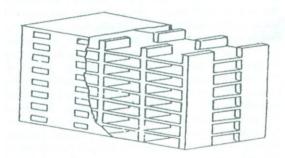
Perspective view of Shear Wall building showing transverse critical section
